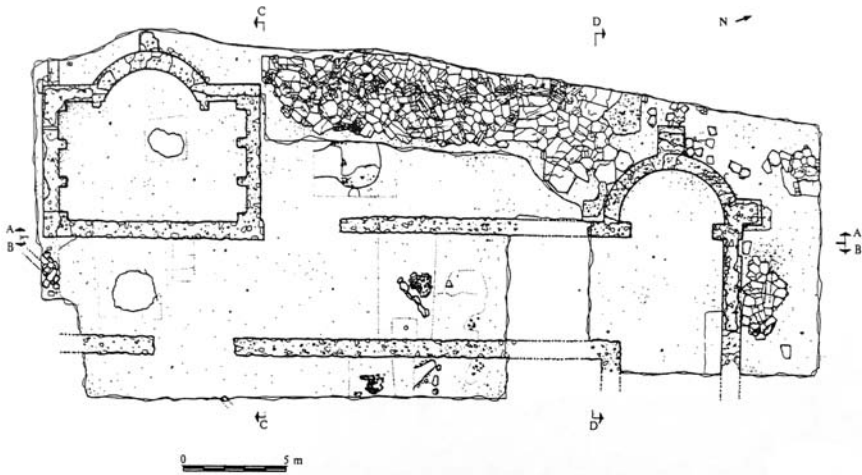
Plan of building in the northern suburb of Mevania. (After Ponzi 1986.)
